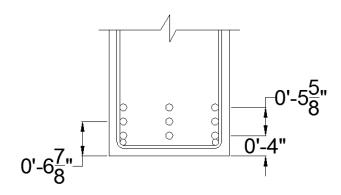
Tension Tie Reinforcement for Design Example 2
